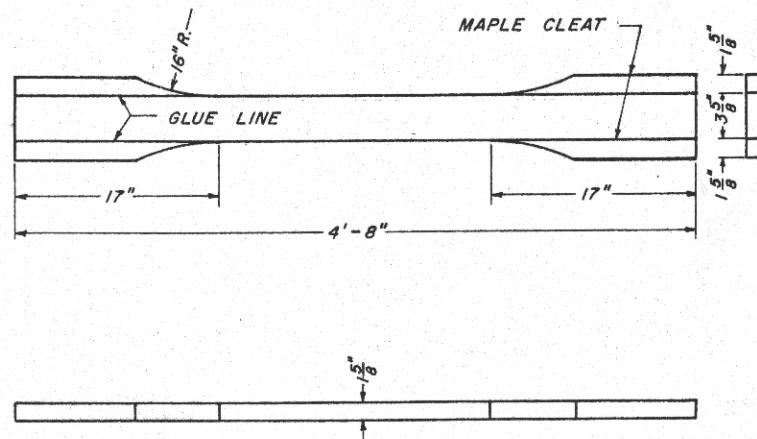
Sketch of nominal 2- by 4-inch tension (G) specimen.
